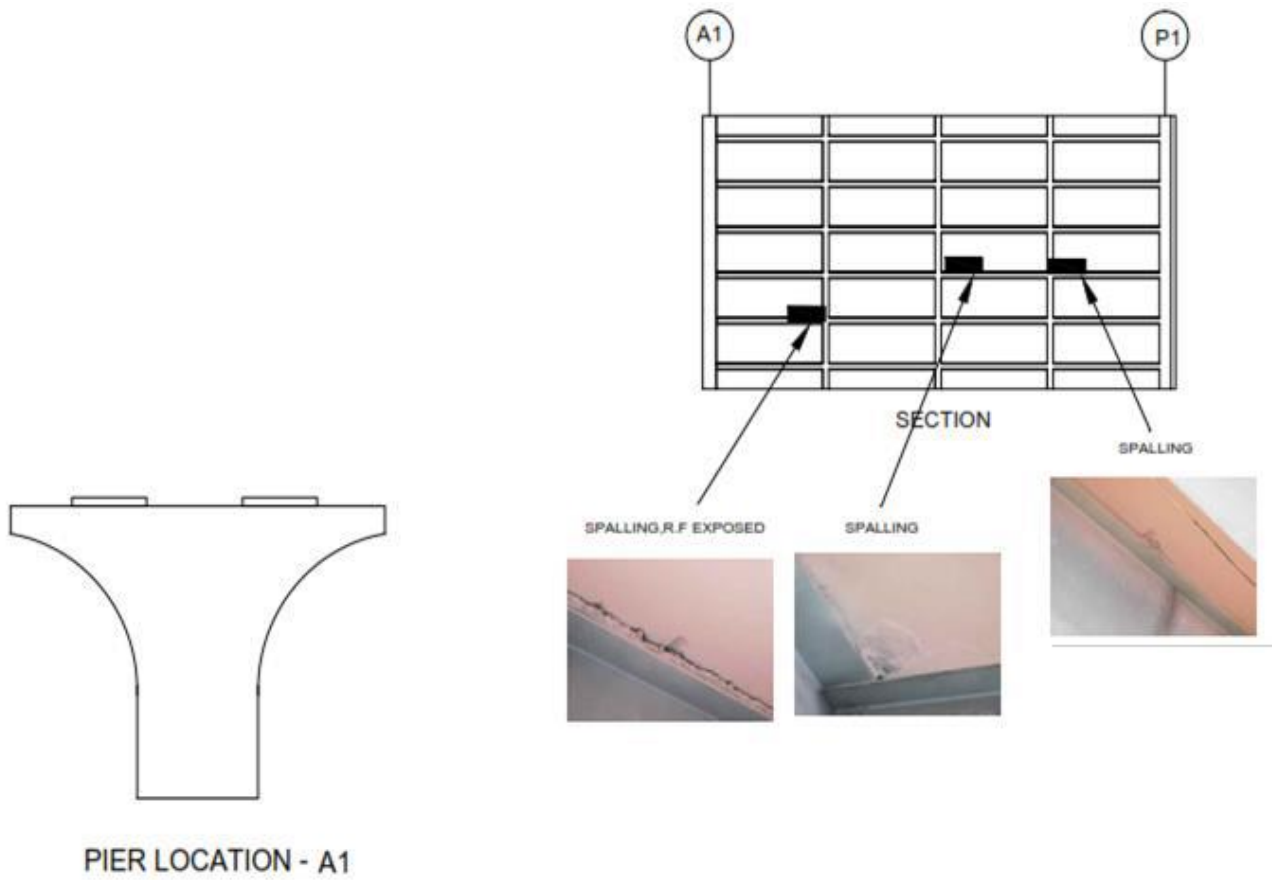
Spalled concrete on the soffit of the panel maybe between A1-P1
